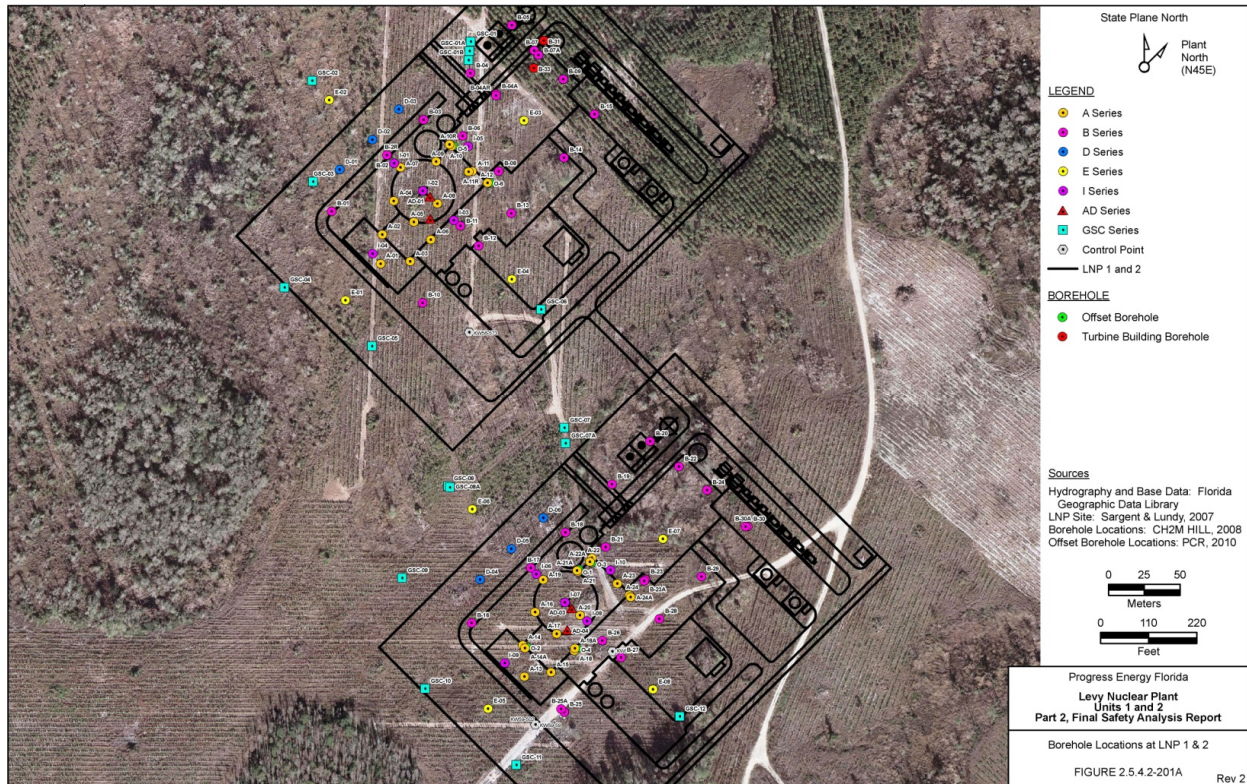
LNP 1 and 2 Boring Location Plan
